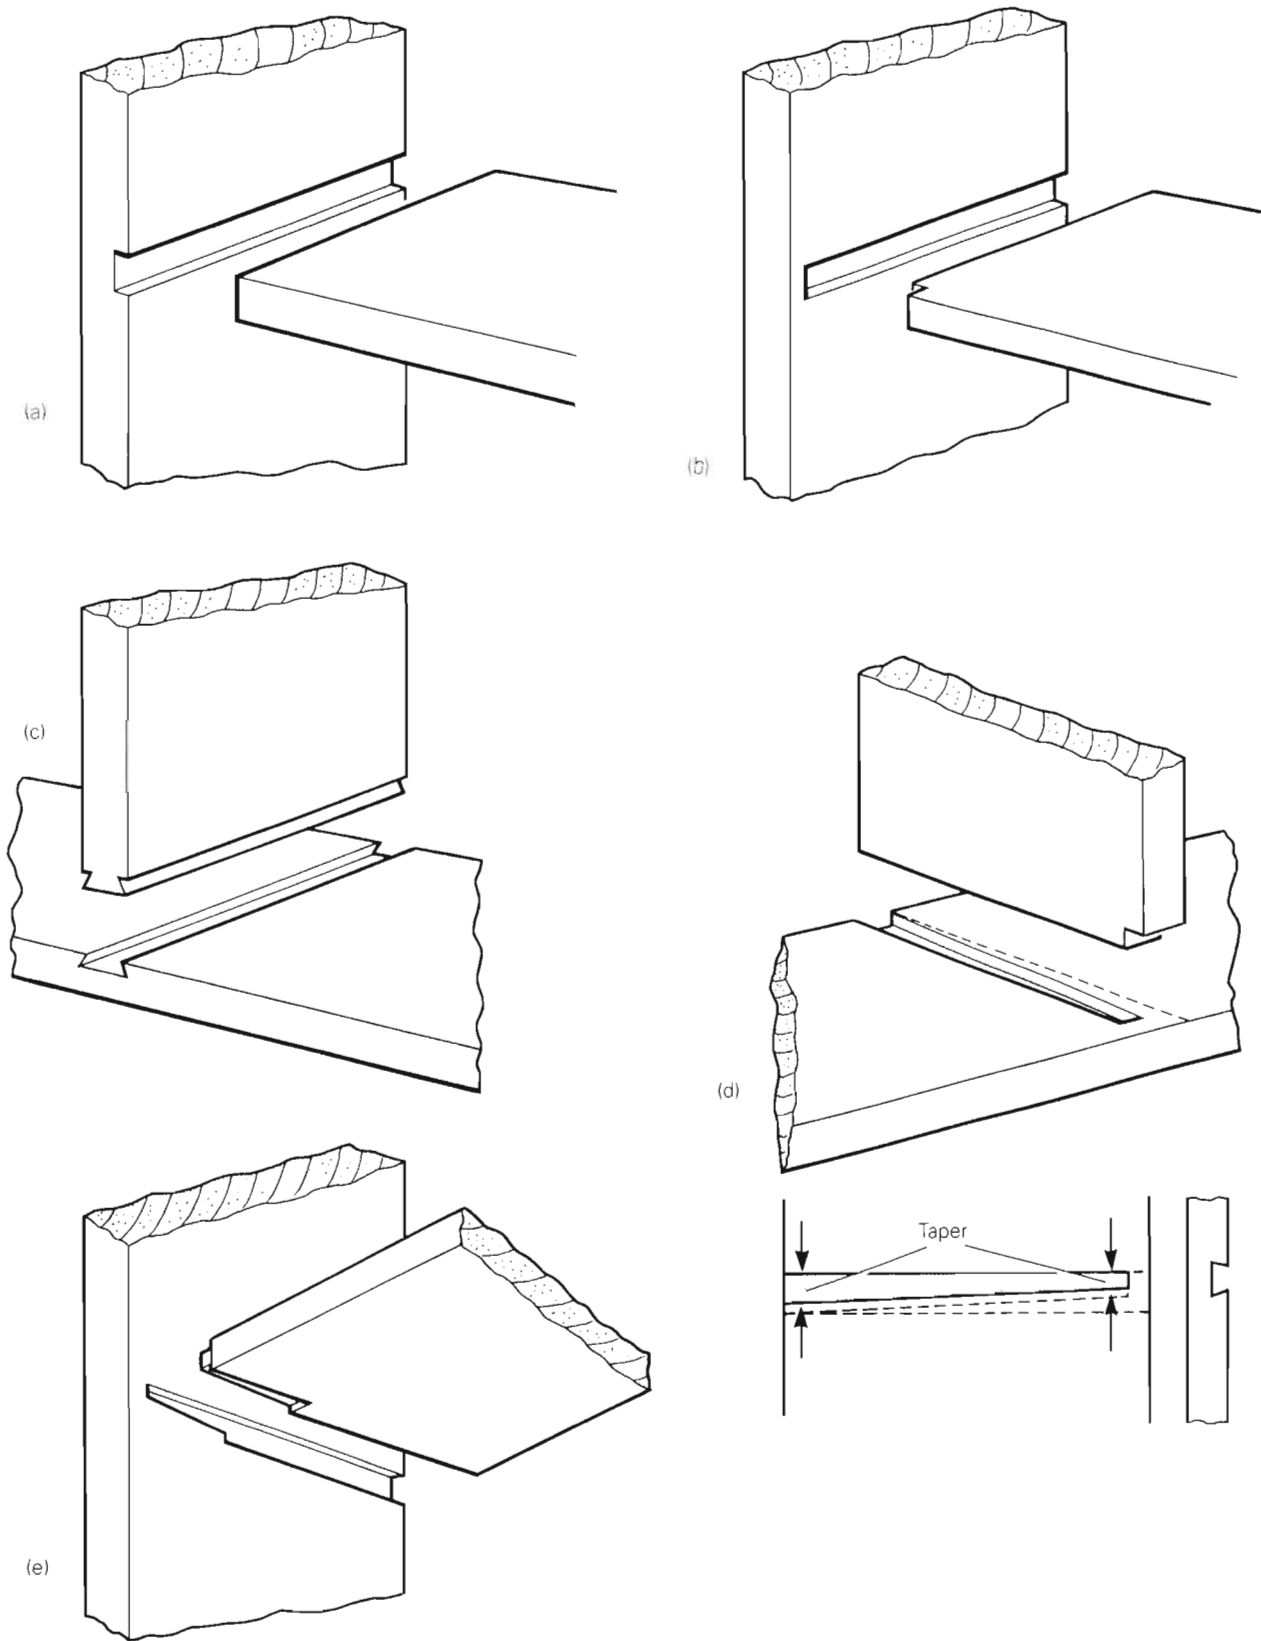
Housing joints: (a) through housing, (b) stopped housing, (c) dovetailed housing, (d) tapered bareface dovetail housing, (e) part dovetail housing.
